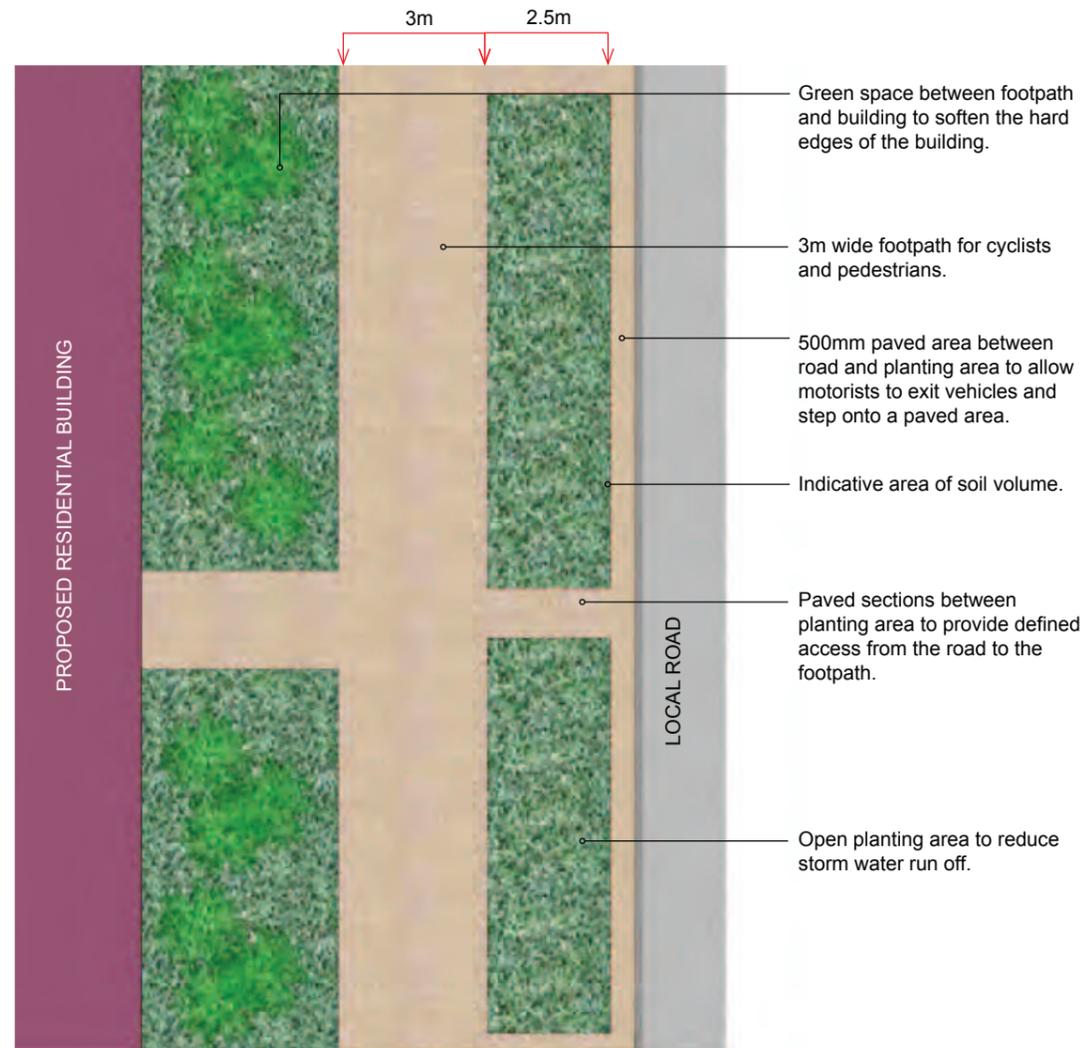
TYPICAL FOOTPATH DETAIL - LOCAL ROADS
